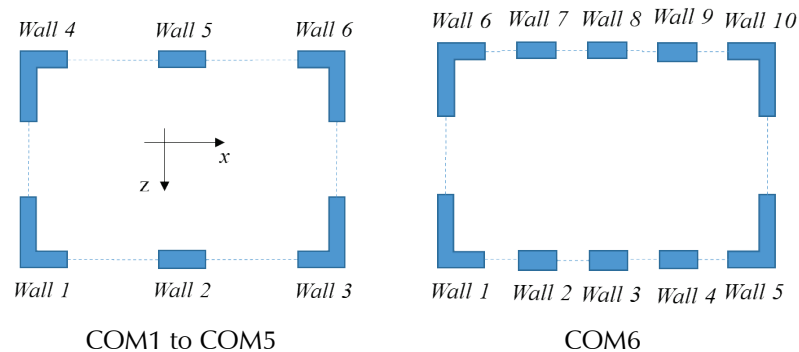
Plan view of wall layouts for commercial building archetypes.
